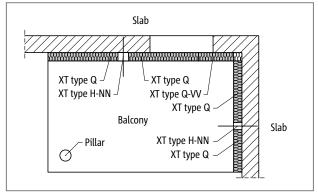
Schöck Isokorb® XT type H: Balcony supported on two sides using columns
